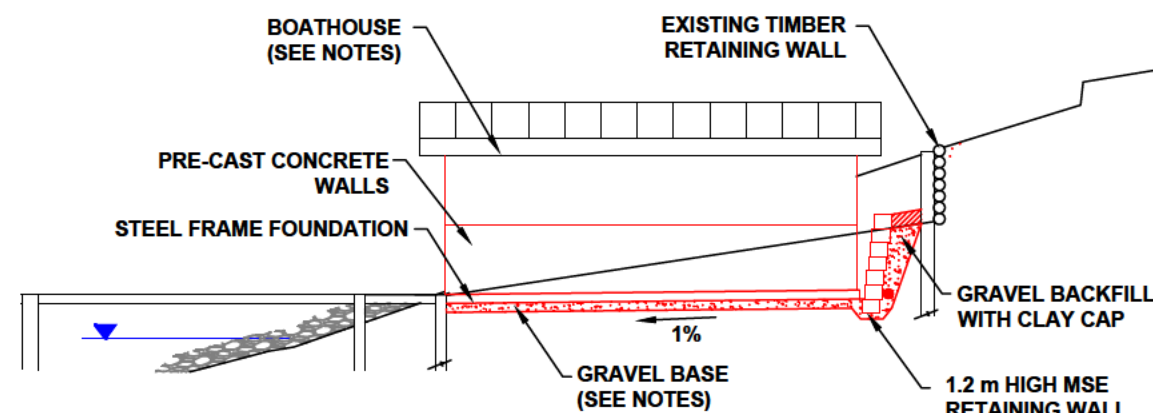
C: PROPOSED BOATHOUSE AND MSE WALL PROFILE (B-B')
